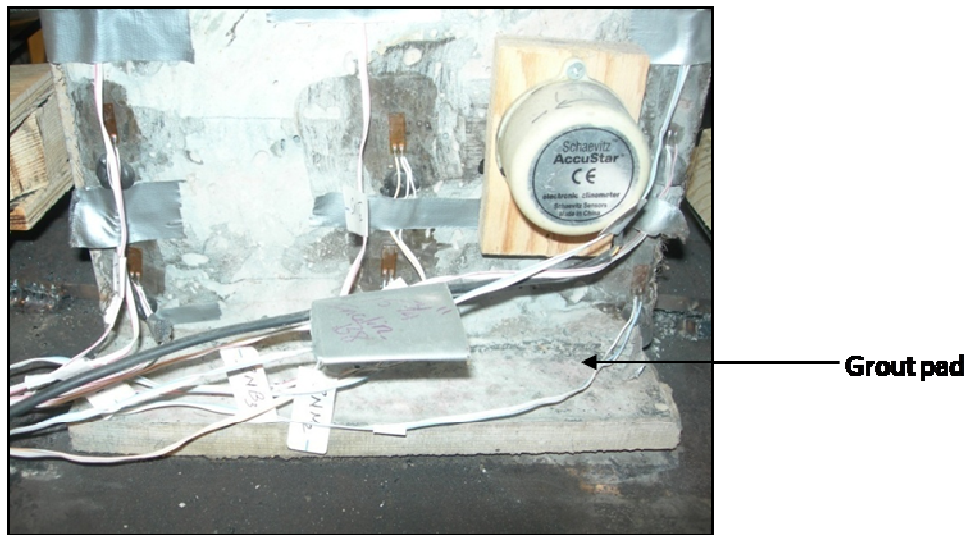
Steel Fiber Reinforced Grout (SFRG) pad.
